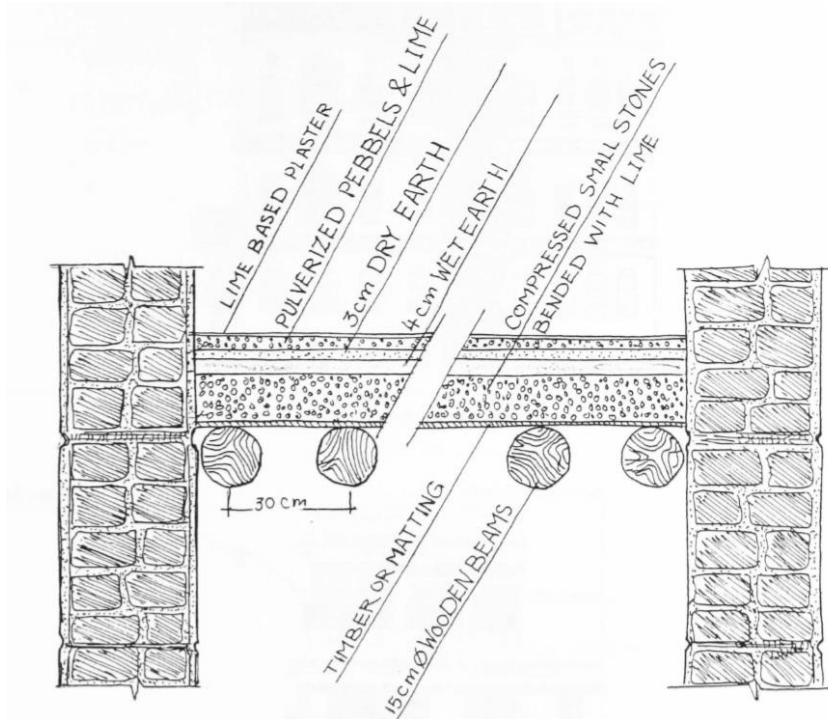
Typical section showing roof and ceiling construction in the traditional coral building (Al-lyaly,1990)
